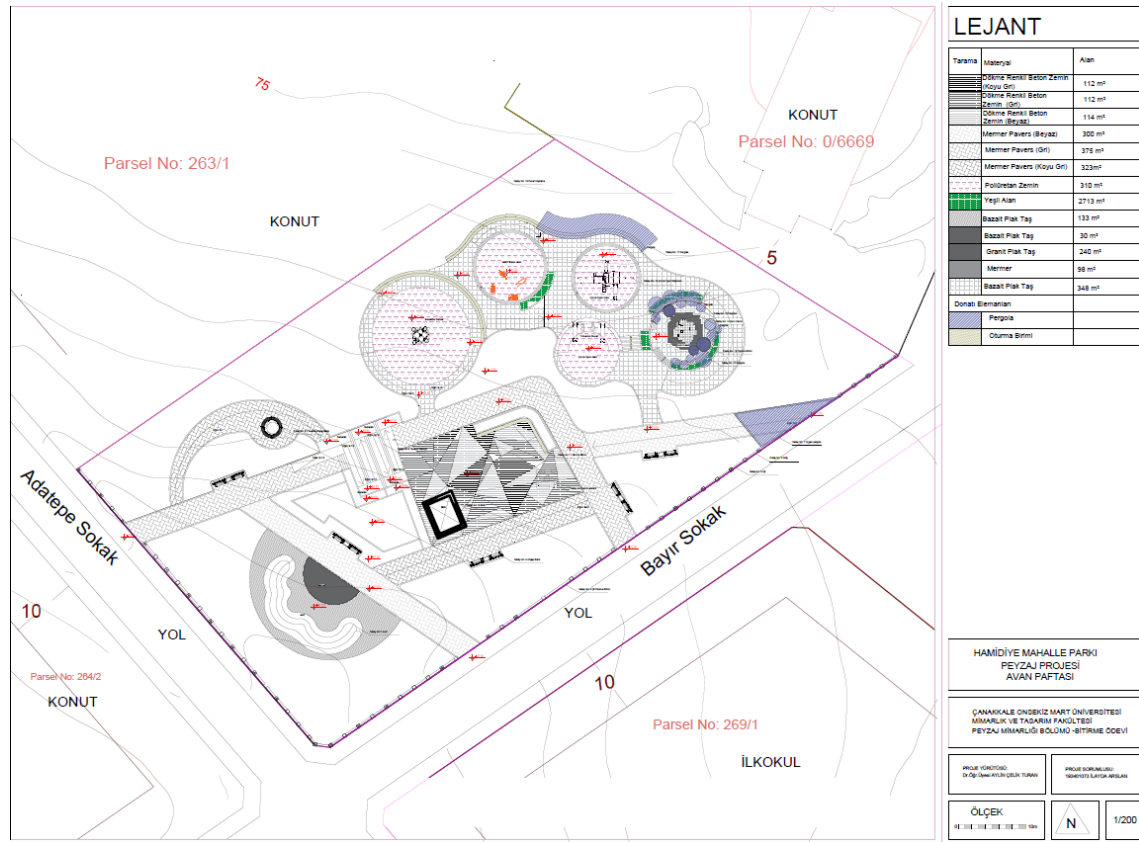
Site Plan (Created by İlayda Arslan usign Autocad 2022)
